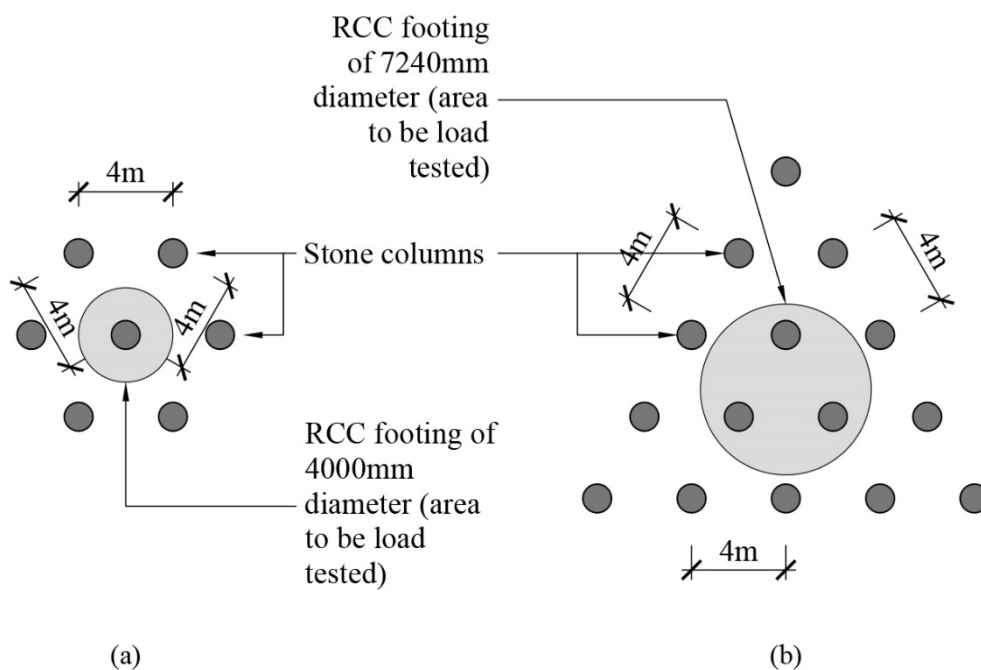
Triangular column arrangement for (a) single column and (b) group of columns (adapted from Maurya, Sharma & Naresh, 2005)
